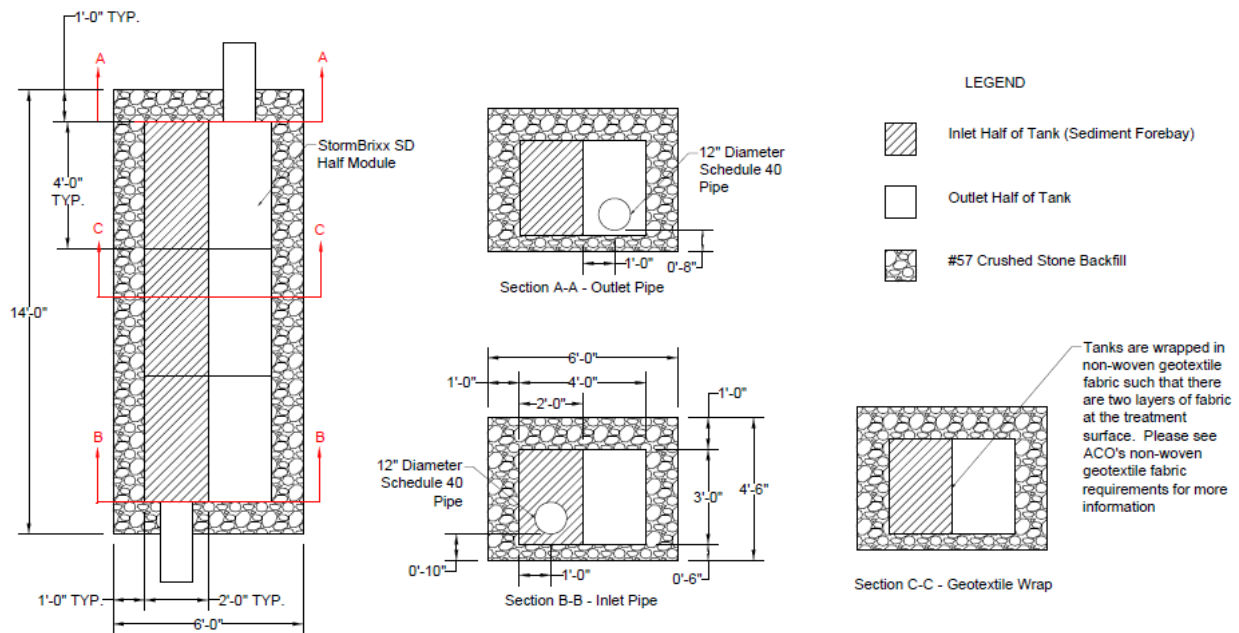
StormBrixx Test Setup Plan and Elevation Views
